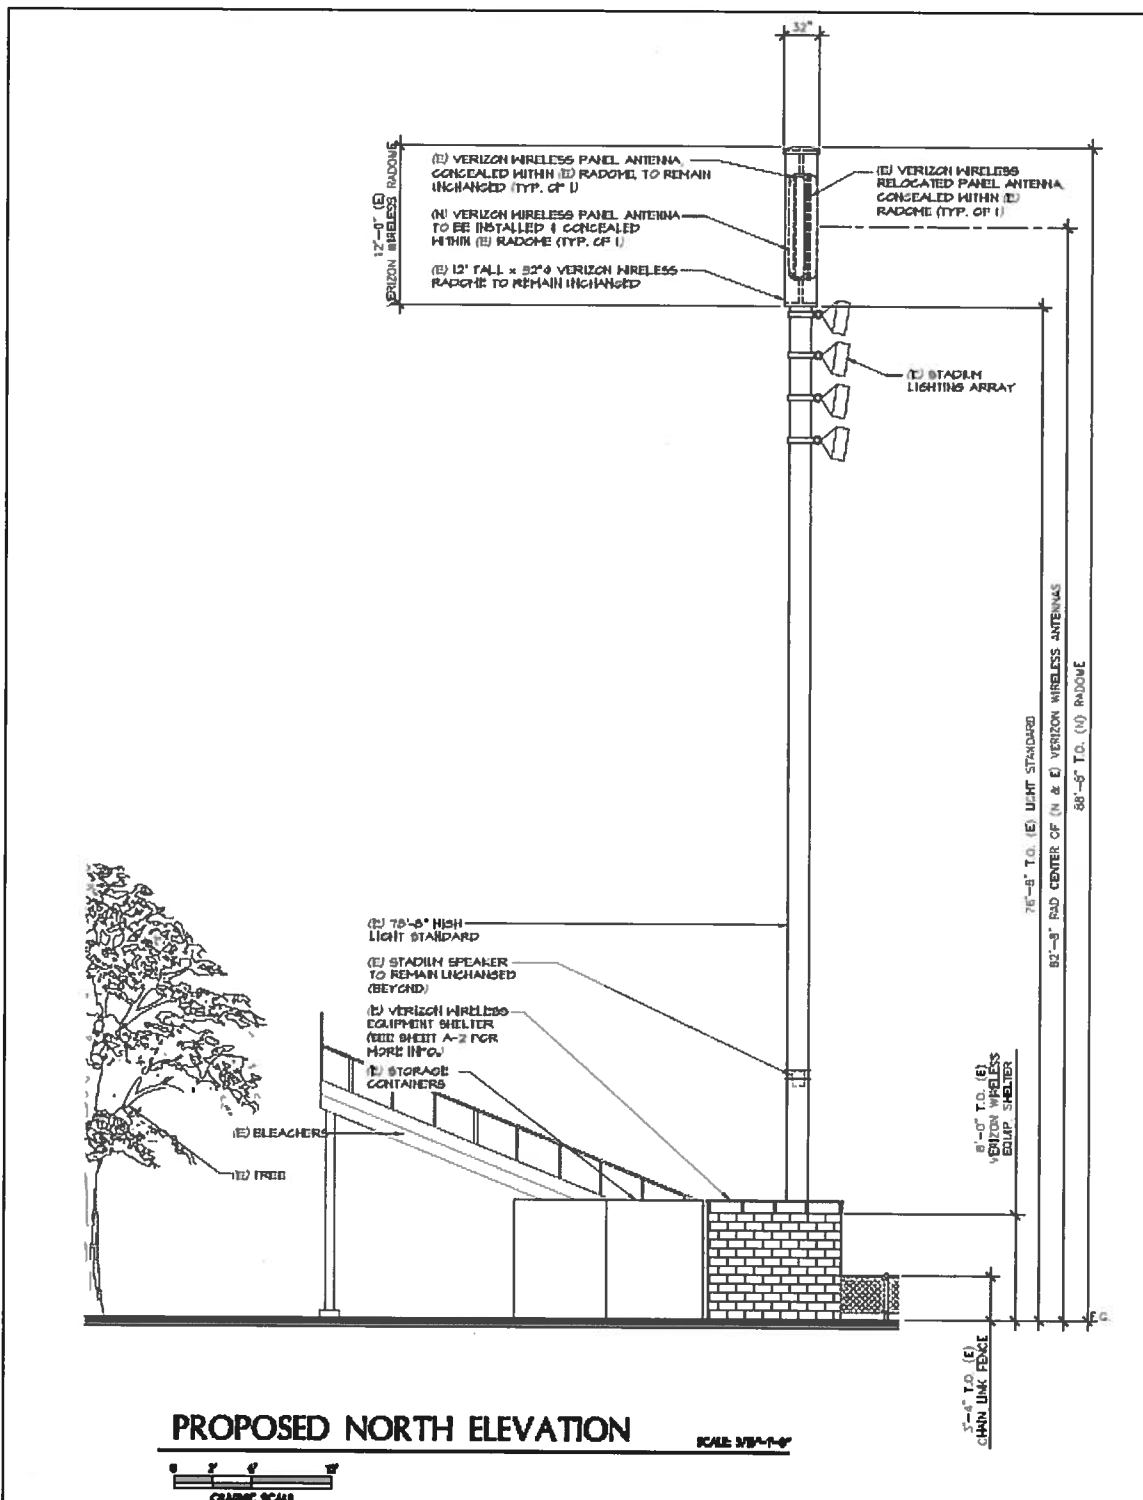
Proposed North Elevation View (Source: Plans dated 01/23/19).
